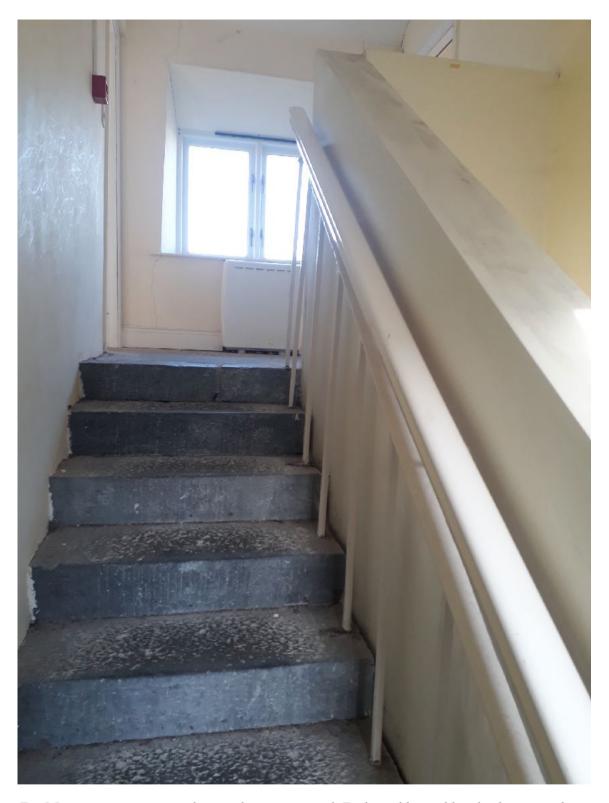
Limestone staircase with wrought iron stair rail. Timber additional handrail supported on stud box inserted in the stair well. The timber handrail and the stud box are proposed to be removed and replaced with a more open structure, possibly glass and steel. To be agreed with Conservation Officer.
